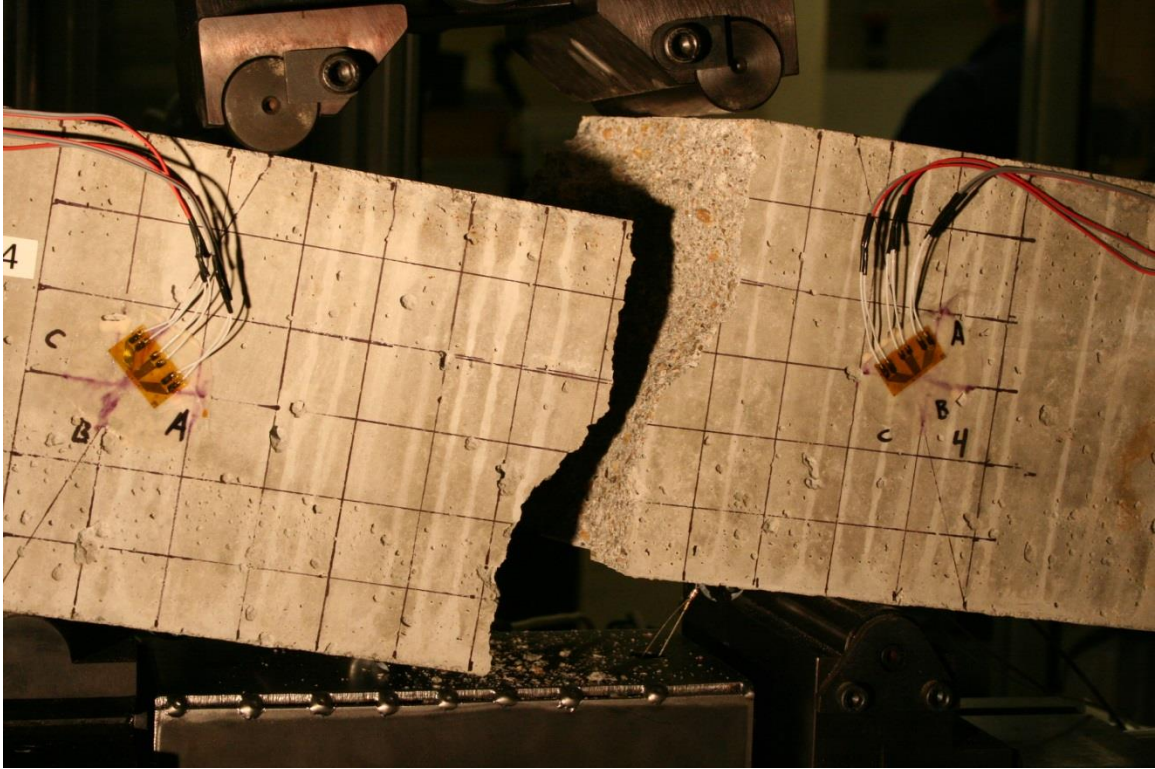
Additional Post-Test Damage, Test No. CFS-4 [11-in. (279-mm) Span]
